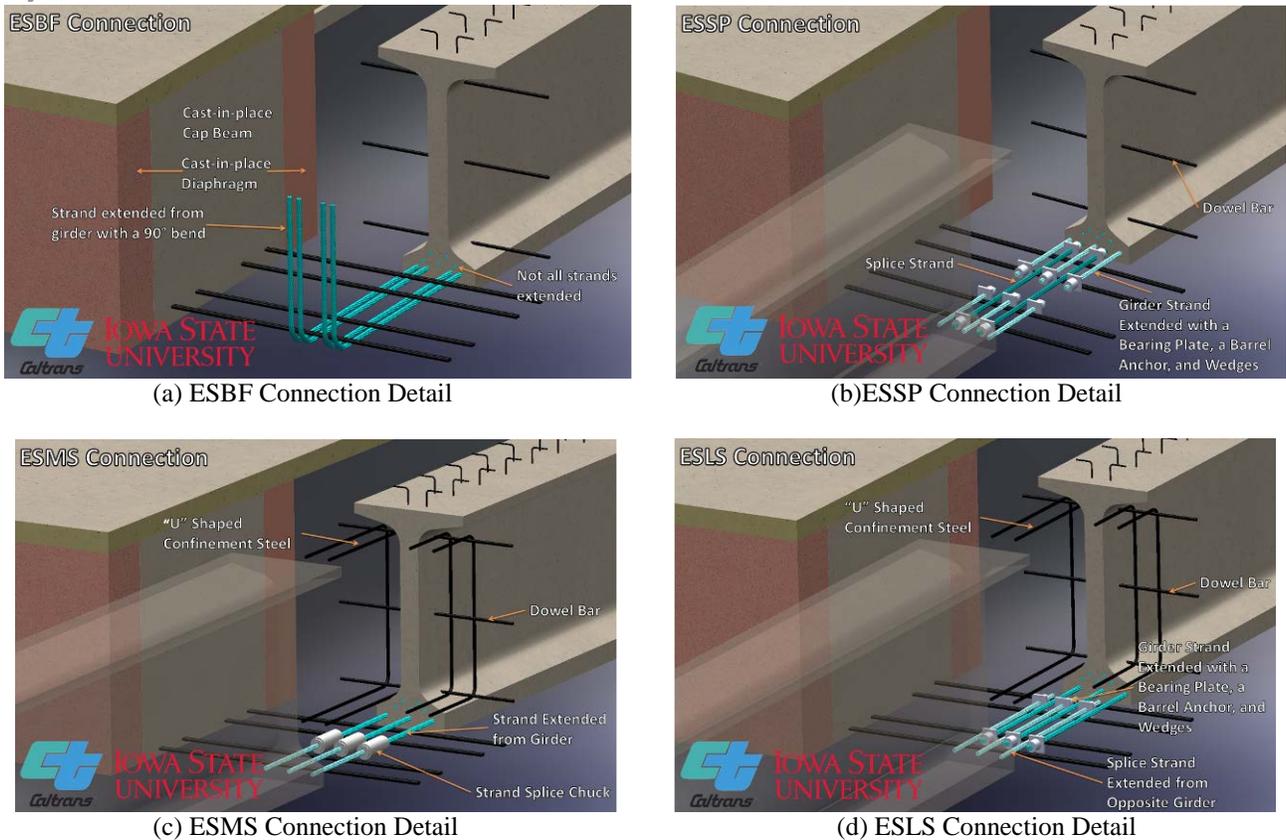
Schematic of Four Connections used between Precast Bulb-tee Girders and Cast-in-place Cap Beam
